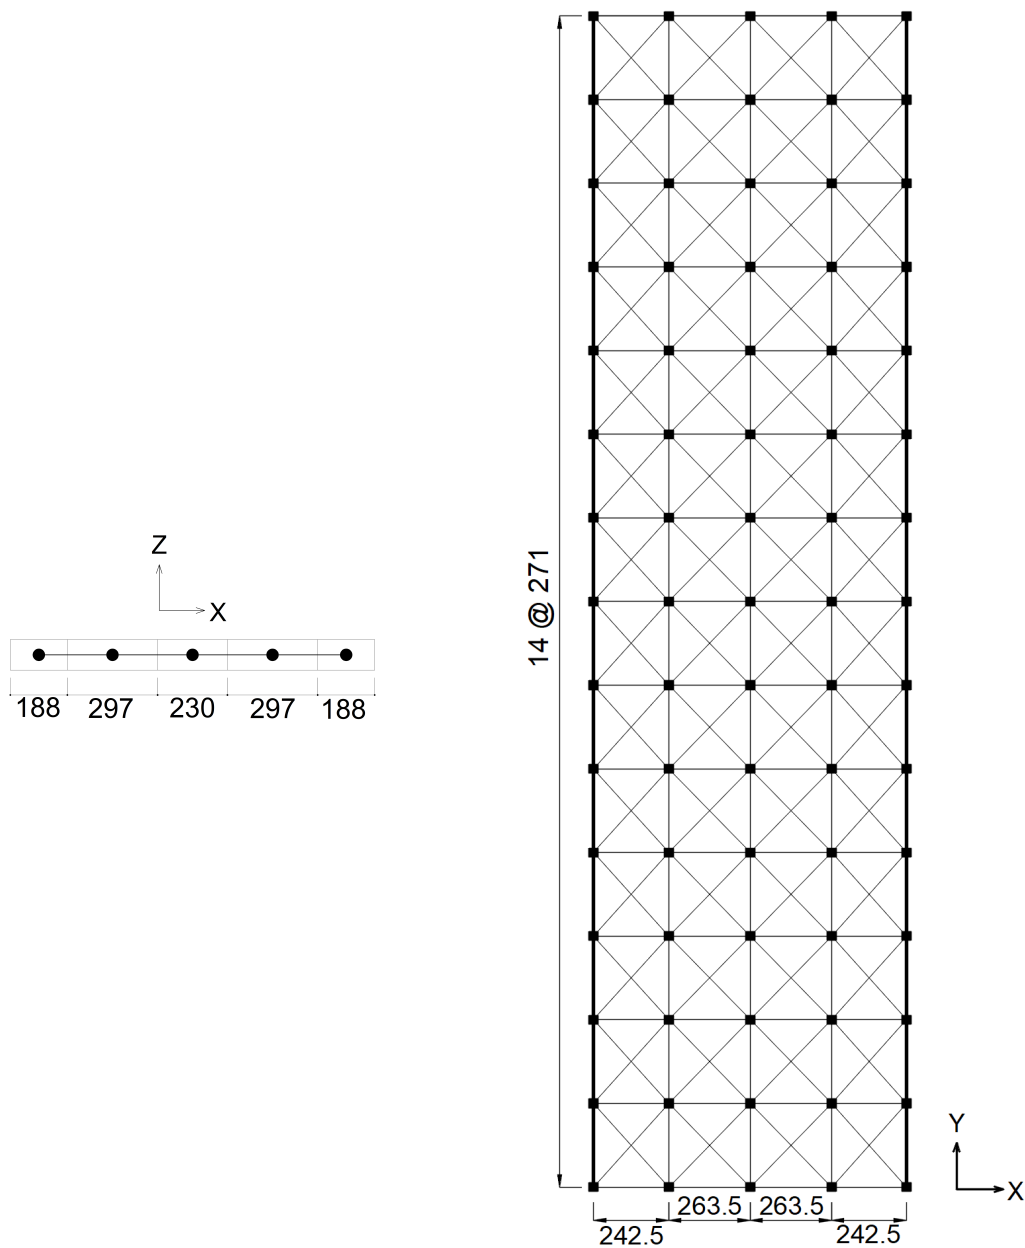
Plan and elevation views of the beam-truss model for RW2 [Unit: mm].
